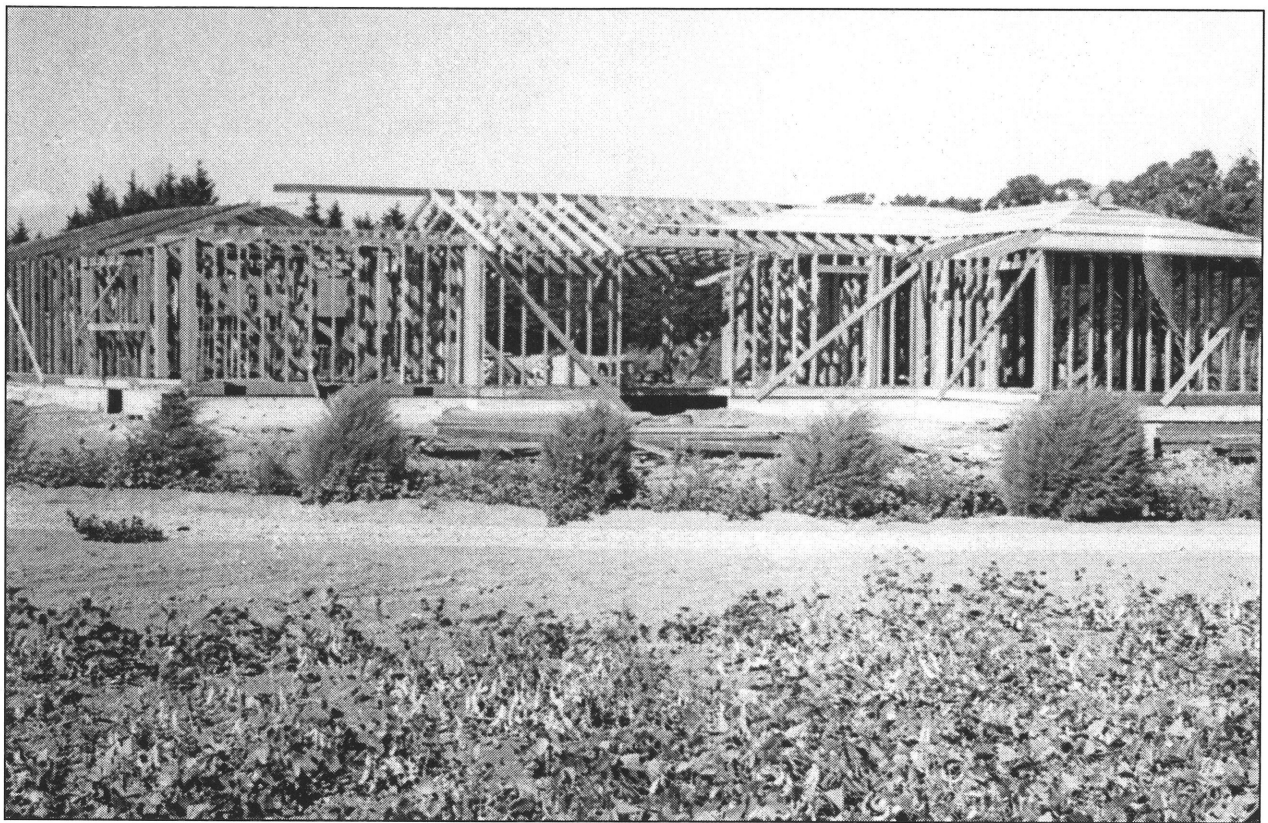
Framing for the farmhouse takes shape, looking north. Chimney will be placed in the opening in the middle of the photograph.
